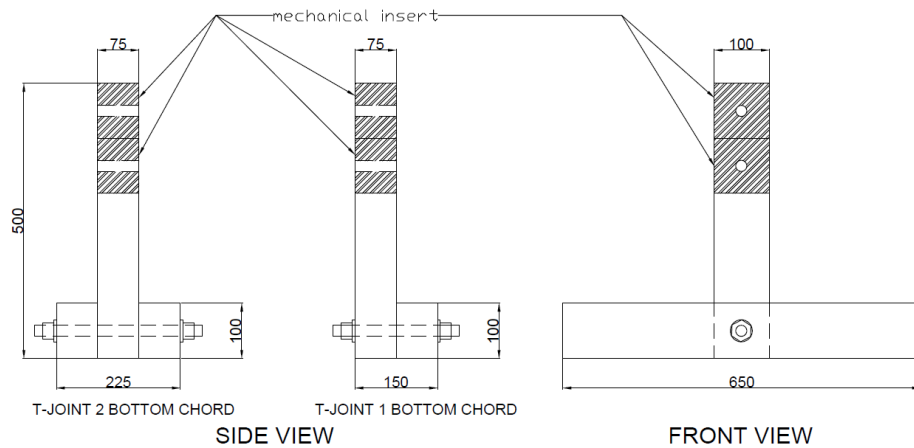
Pultruded GFRP T-joint bolted configurations (dimensional unit in mm)
